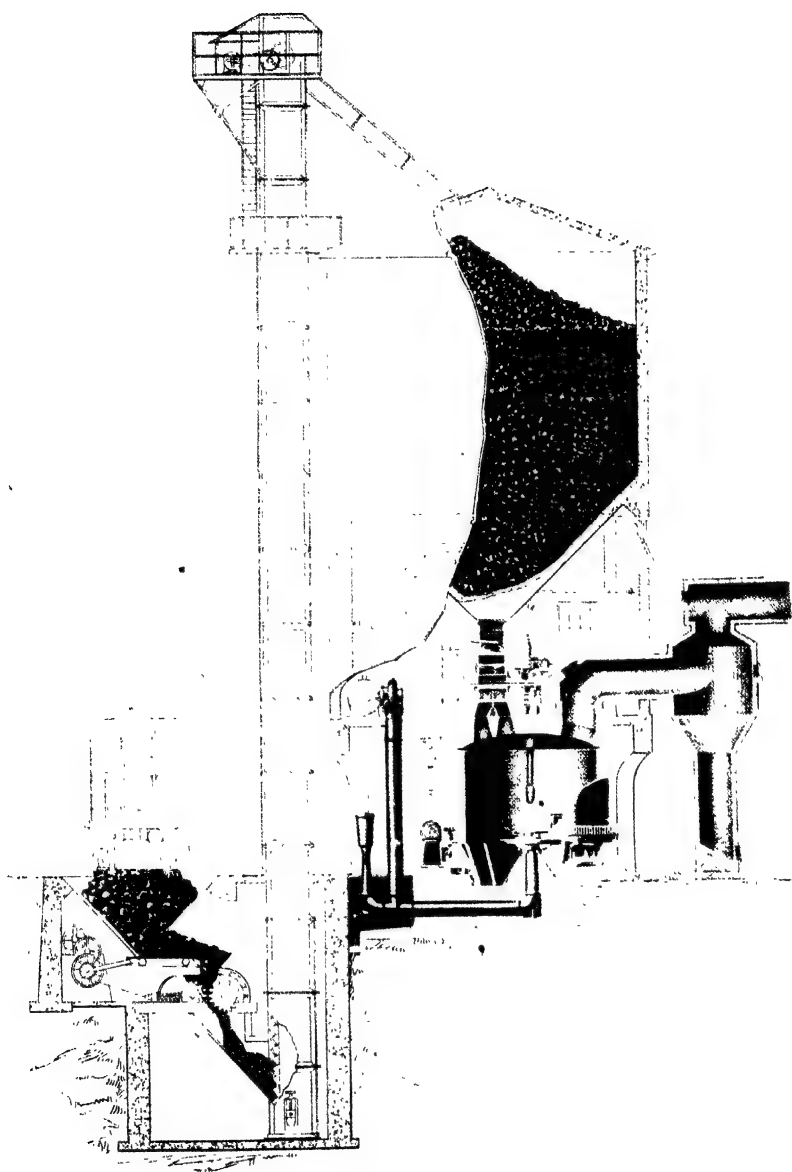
COAL HANDLING AND STORAGE PLANT FOR HIGH DUTY PRODUCERS (DIXON).
